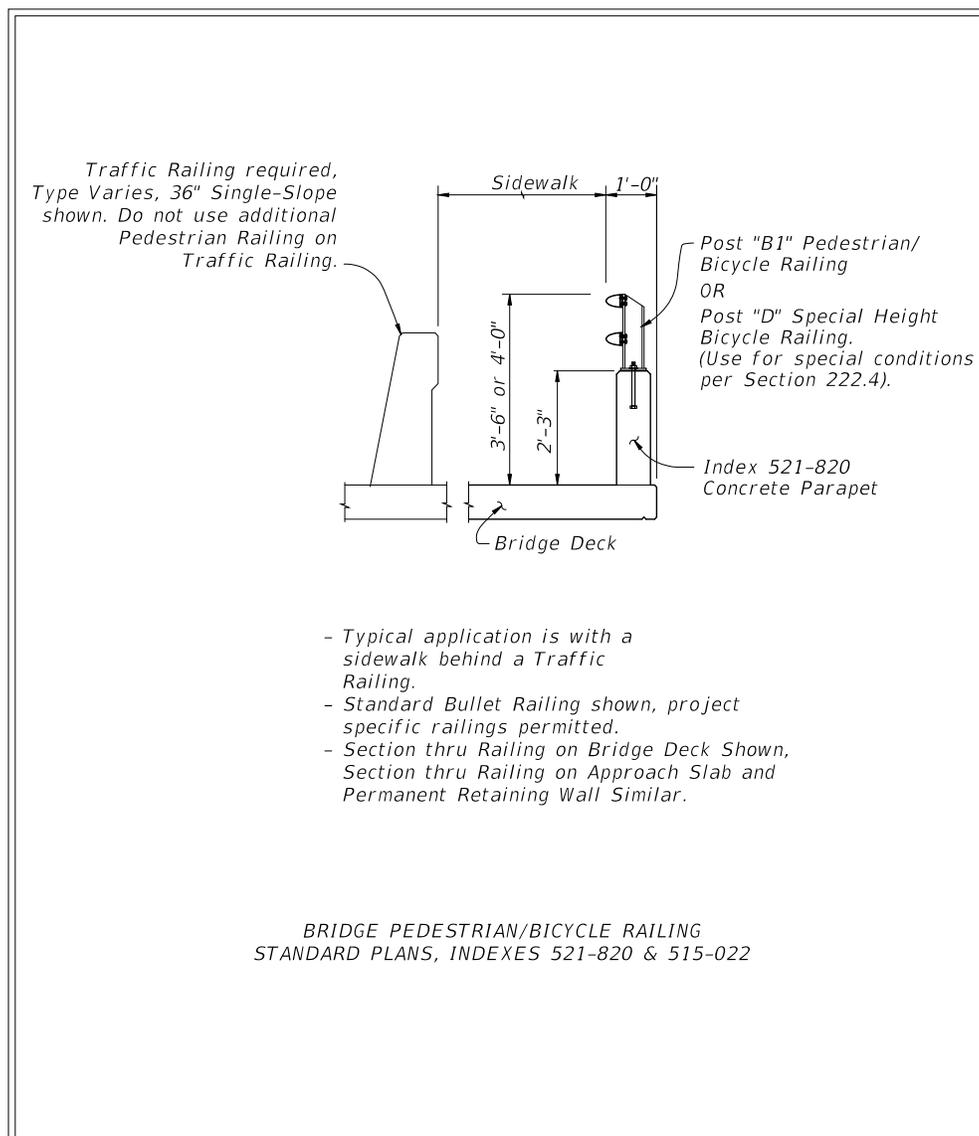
Bridge Railing – Pedestrian/Bicycle Railing
